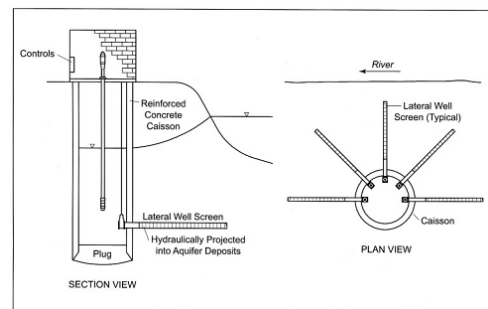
Cross section and plan view of a horizontal collector well (After Hunt, 2010)
